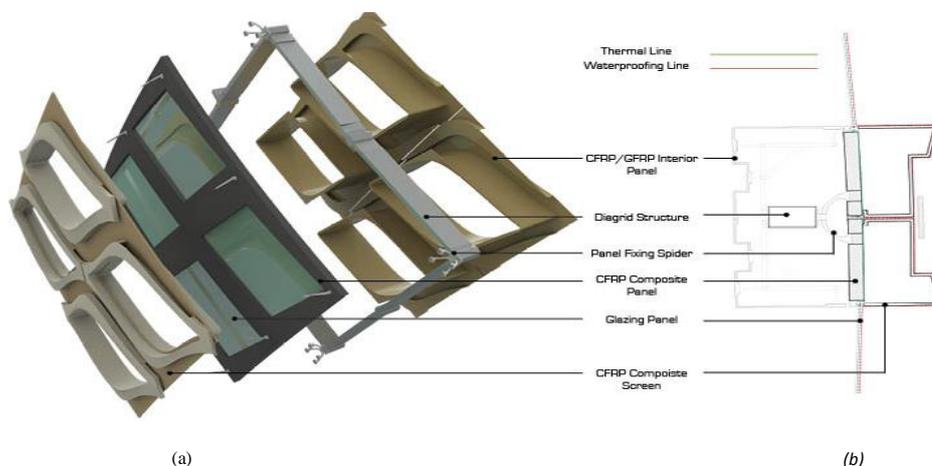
Build-up optimized design approach using CFRP; (a) exploited view (b) cross-section detail.
